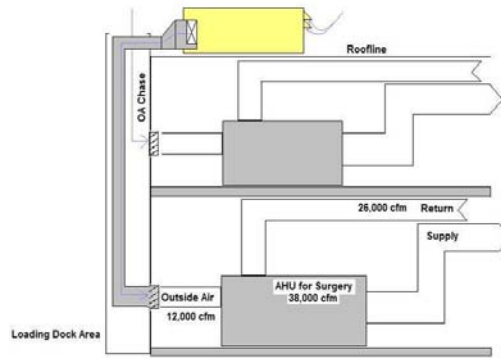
Desiccant Installed to Pre-condition Ventilation Air to Surgery Suite AHU
